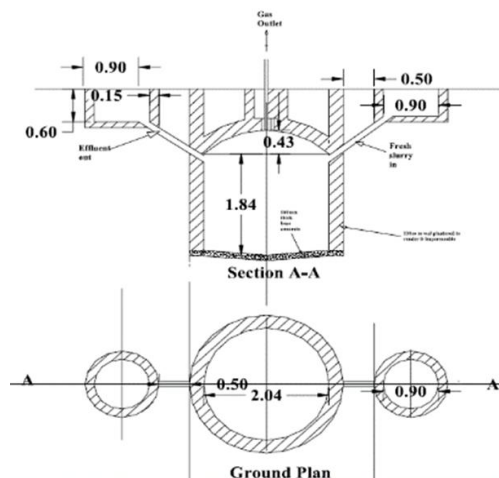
Engineering plan and section showing dimensions and flow paths for a standard household biogas digester
